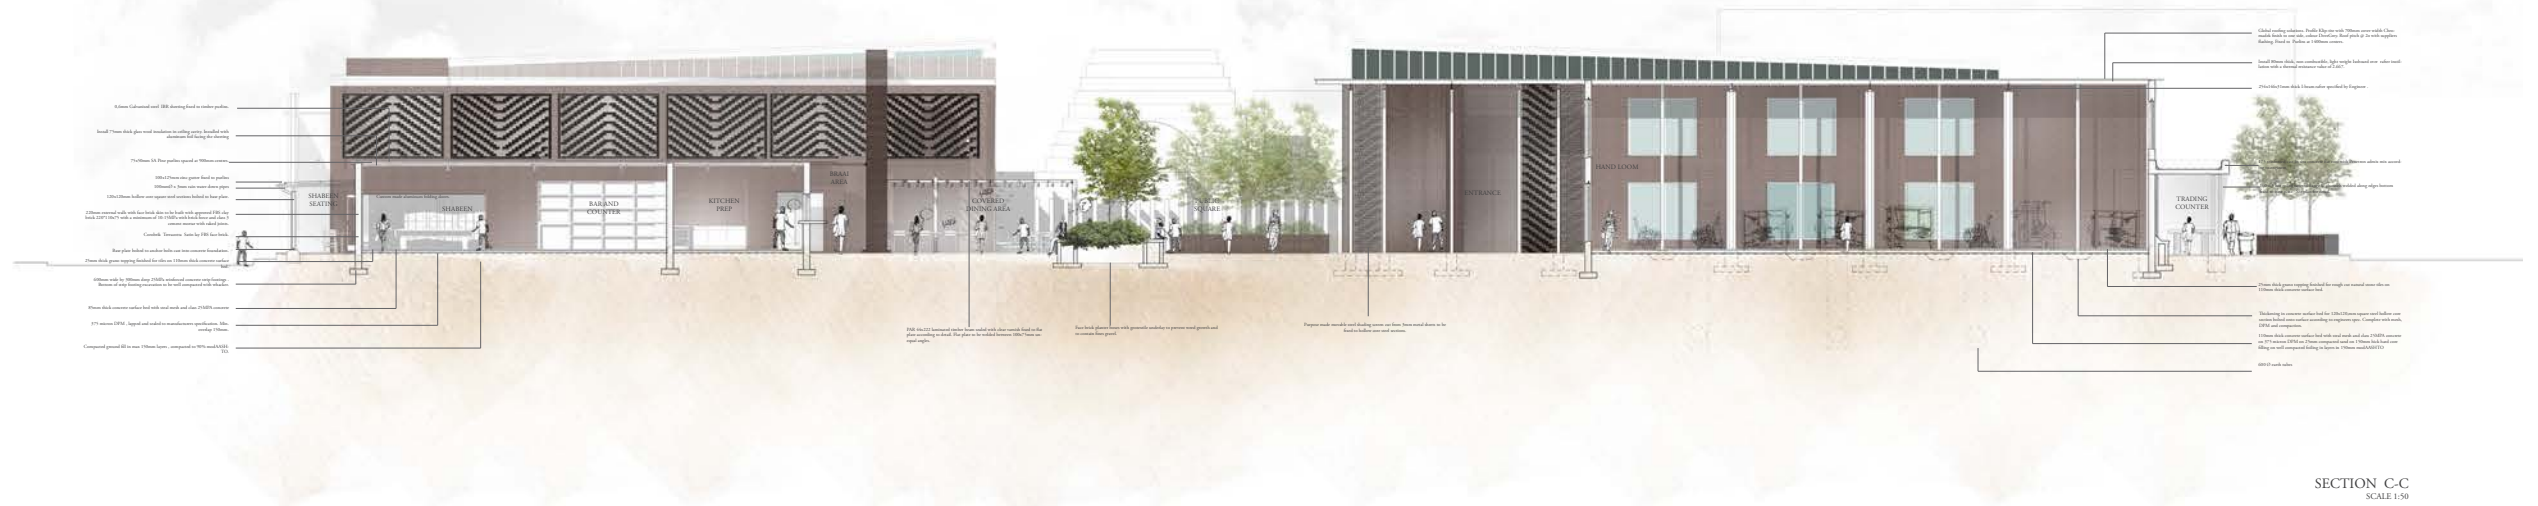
Section C-C through the handloom factory, outside eating space and shabeen. (nts)
